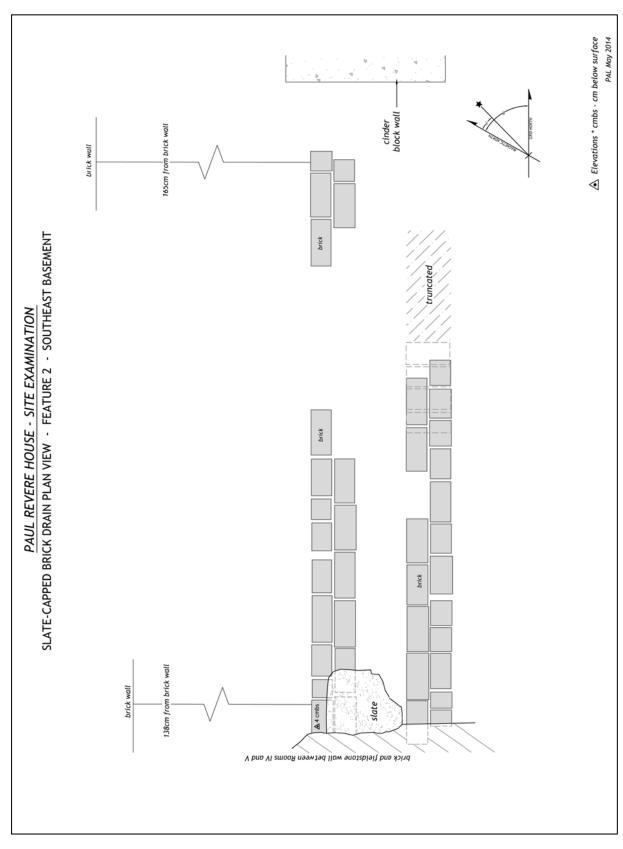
Feature 2 – Slate-capped brick drain, Southeast Basement, plan view.
